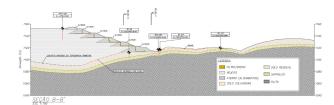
Structural section of dam #3. Note that the thickness of the tailings pond is inferred and not well defined.
